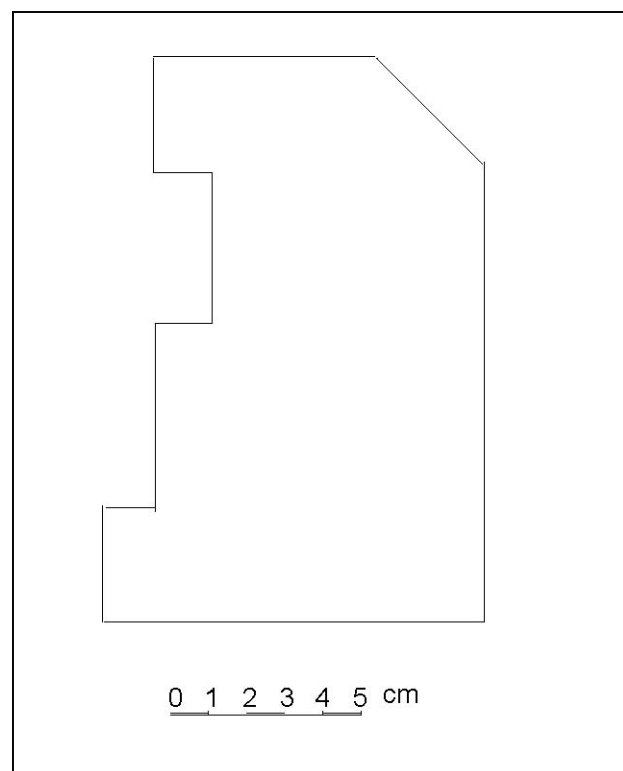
West facing section of the southern wallplate (*Scale 1:2*)
